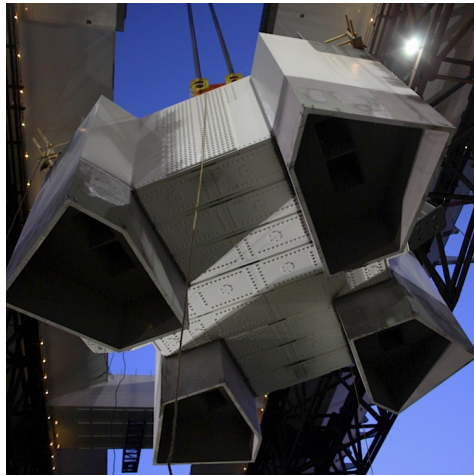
Saddle grillage being lifted to the top of the tower (Ref.: www.baybridgeinfo.org).
